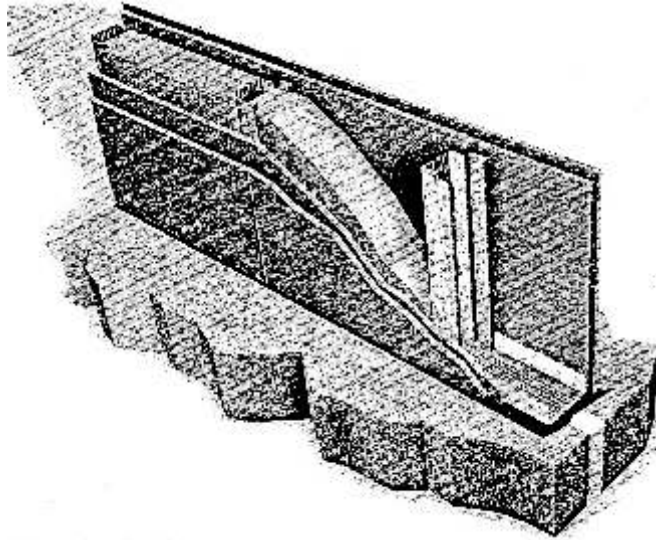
AWS (Acoustic Wall Stud) wall structure.
